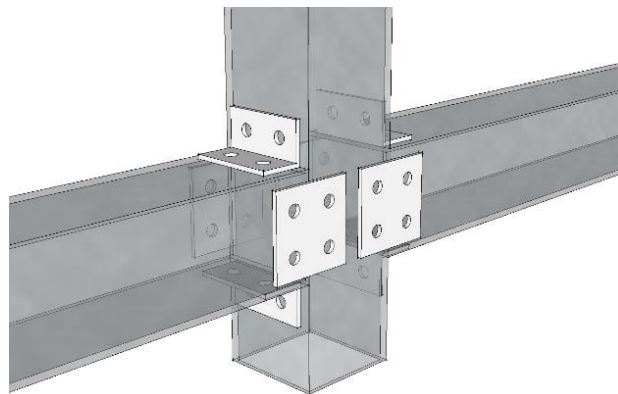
Design of Specimen A2: welded - bolted beam-to-column connection
